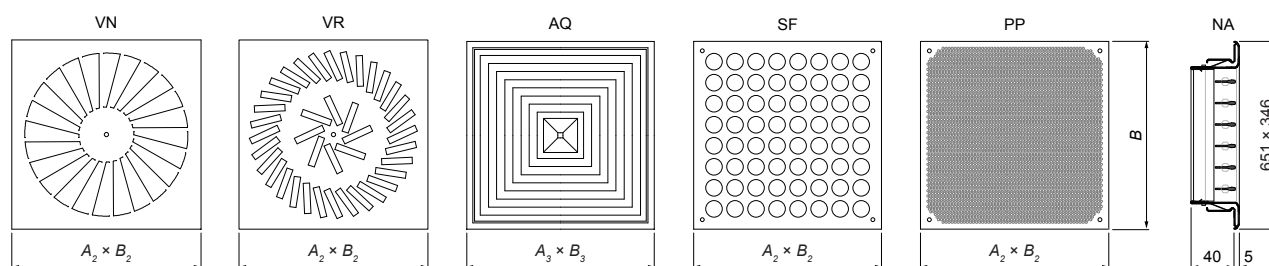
Dimensions of front diffuser panels and grilles for the clean filtering cassettes.
